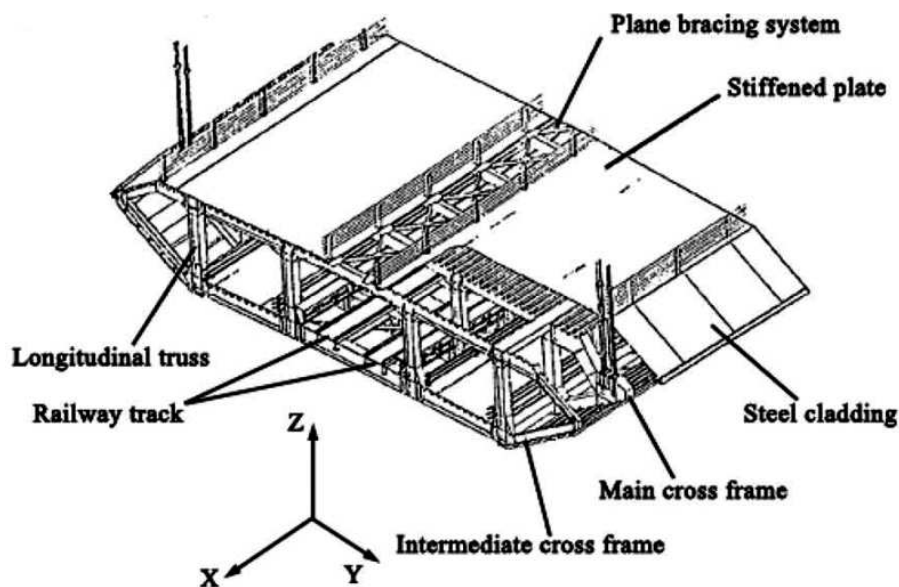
A typical 18m-deck section of the main span of the Tsing Ma Bridge.
